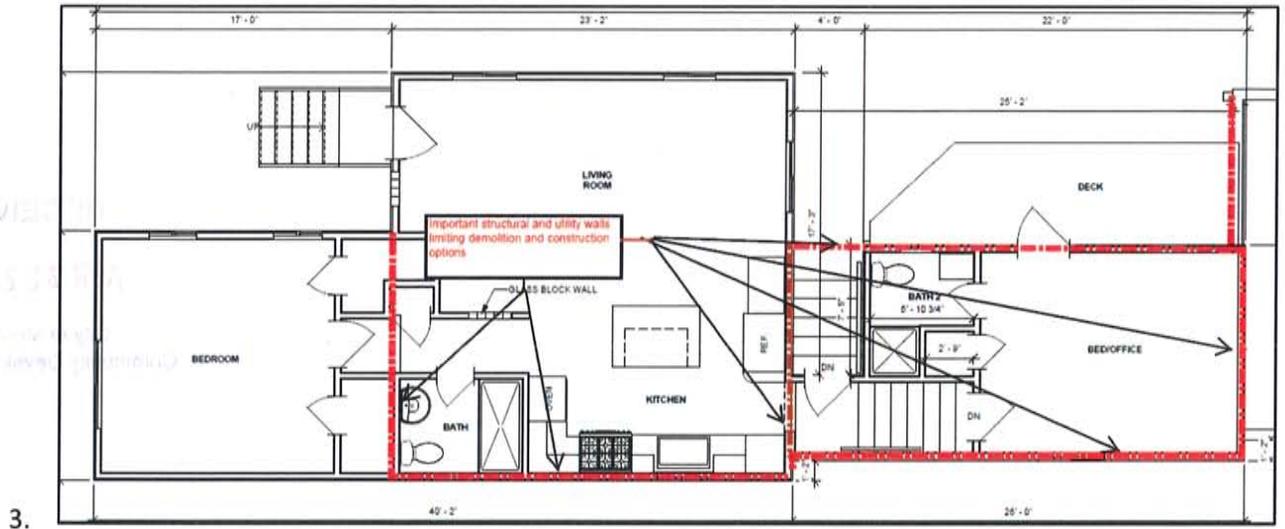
Location of Structural and Utility Walls Limiting Demolition
